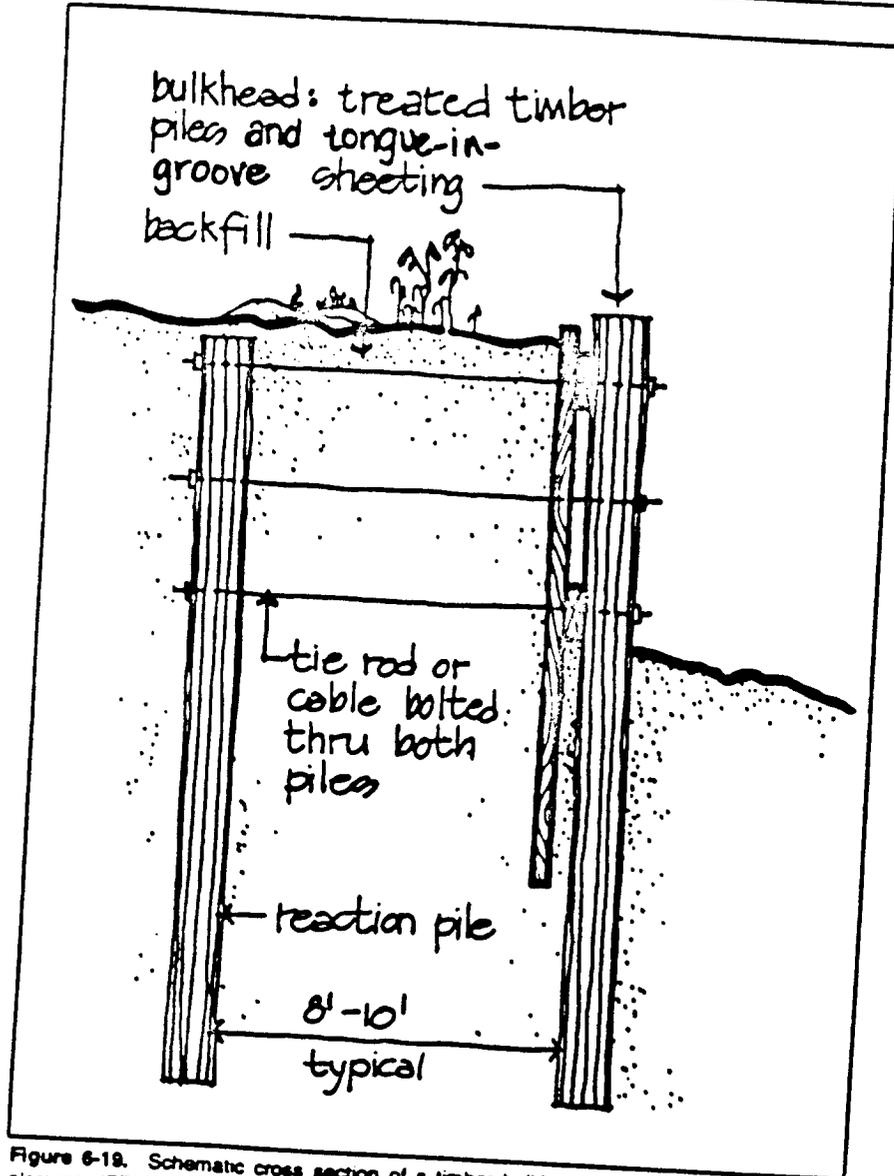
Schematic cross section of a timber bulkhead showing important design elements (FEMA, 1986).
